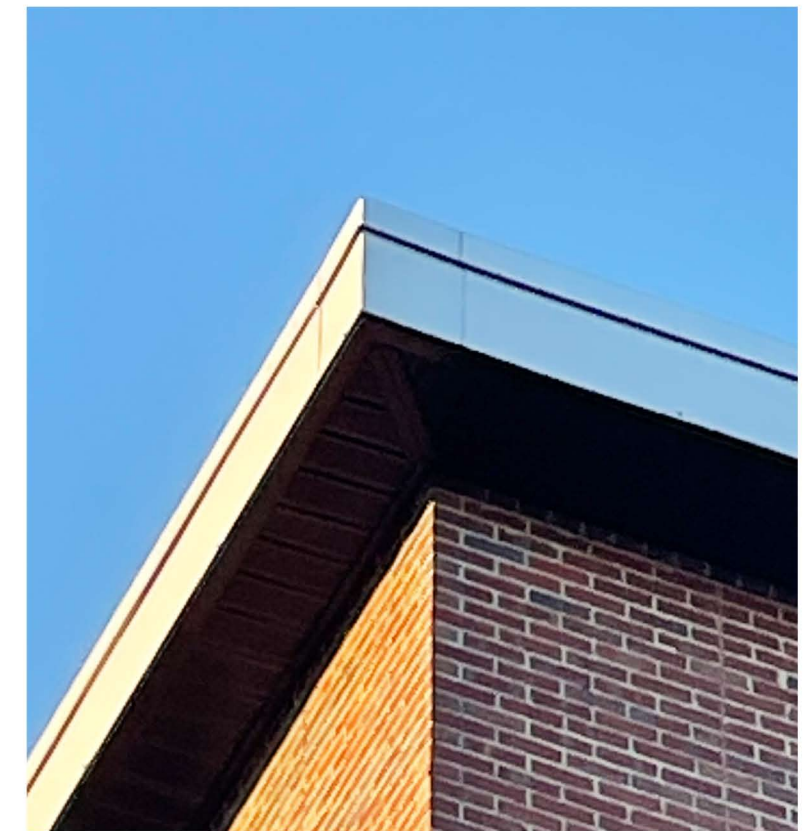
PHOTO OF EXISTING CORNICE BRAKE METAL AND VINYL SOFFIT (EXISTING VINYL SOFFIT TO REMAIN)
